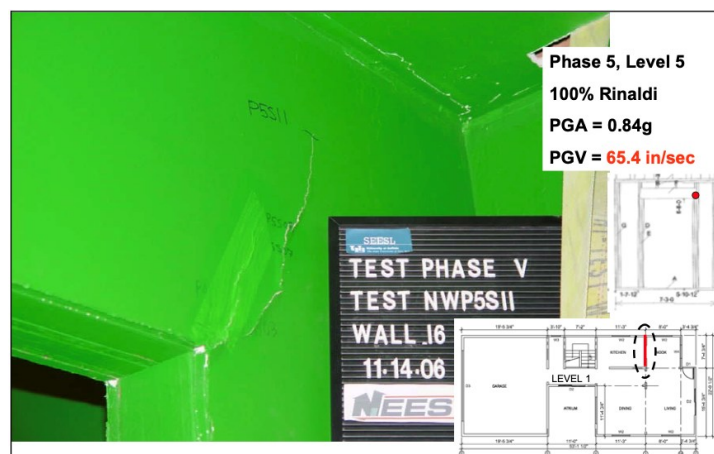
Cracking and Buckling of Gypsum Wallboard at Door Opening (Christovasilis et al., n.d., 2009). Table below summarises the damage observed and shown above:
